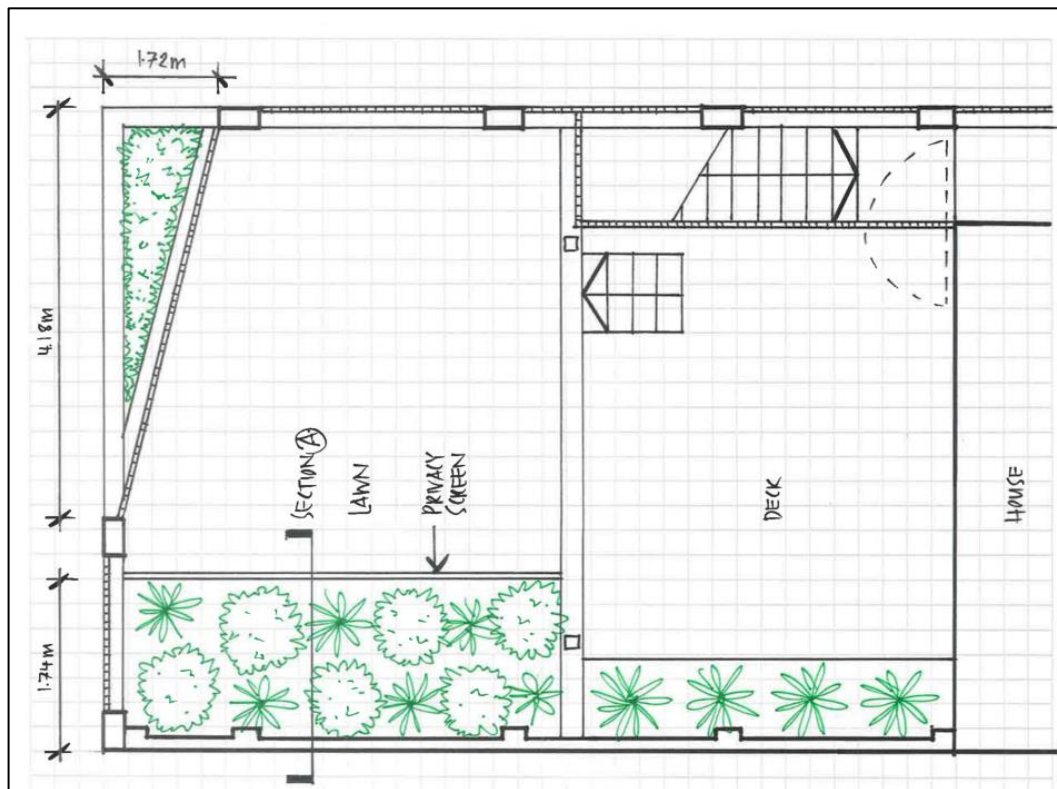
Modified terrace plan – 2 Barrett Place, Randwick
